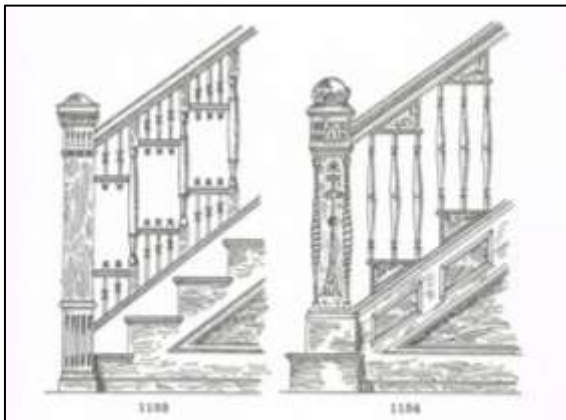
Stair elevations from the Universal Design Book. Note design 1154 features inlaid paneling similar to the farmhouse staircase.
